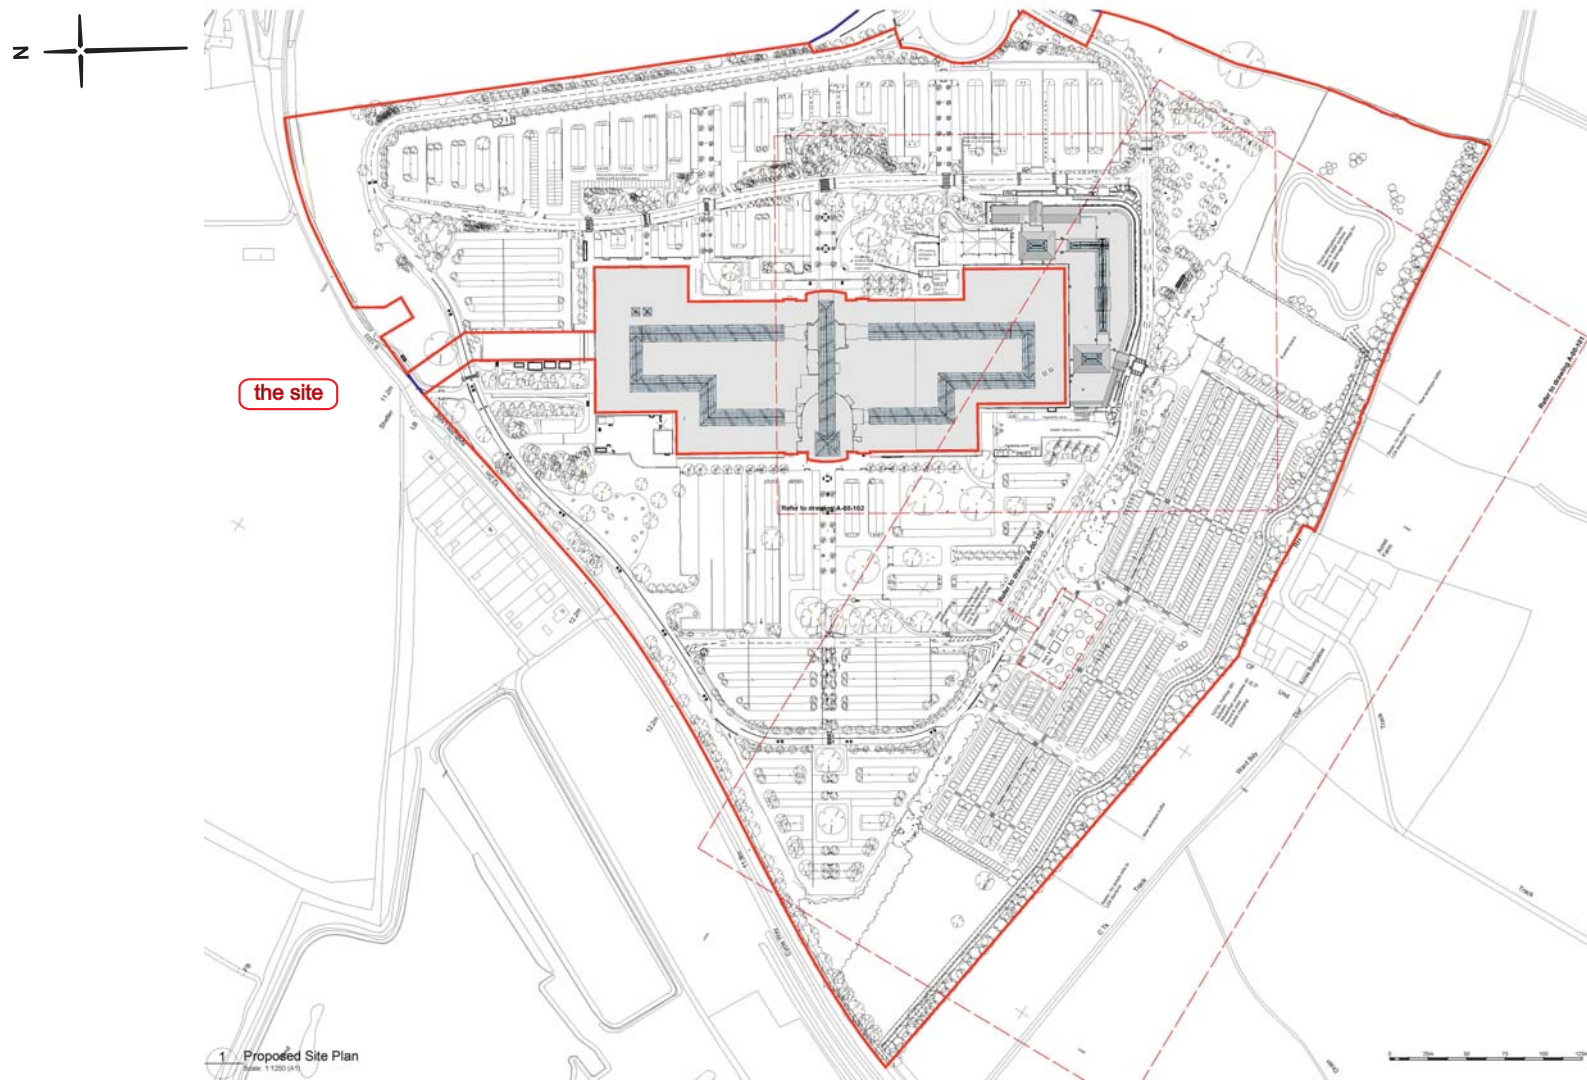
Proposed site plan (Holder Mathias Architects, dwg 4418 A-00-100, 19.07.2019)
